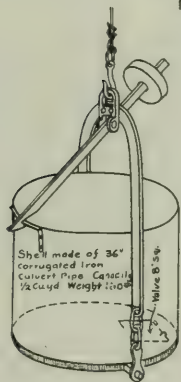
Single Line Bucket for Depositing Concrete Under Water.
